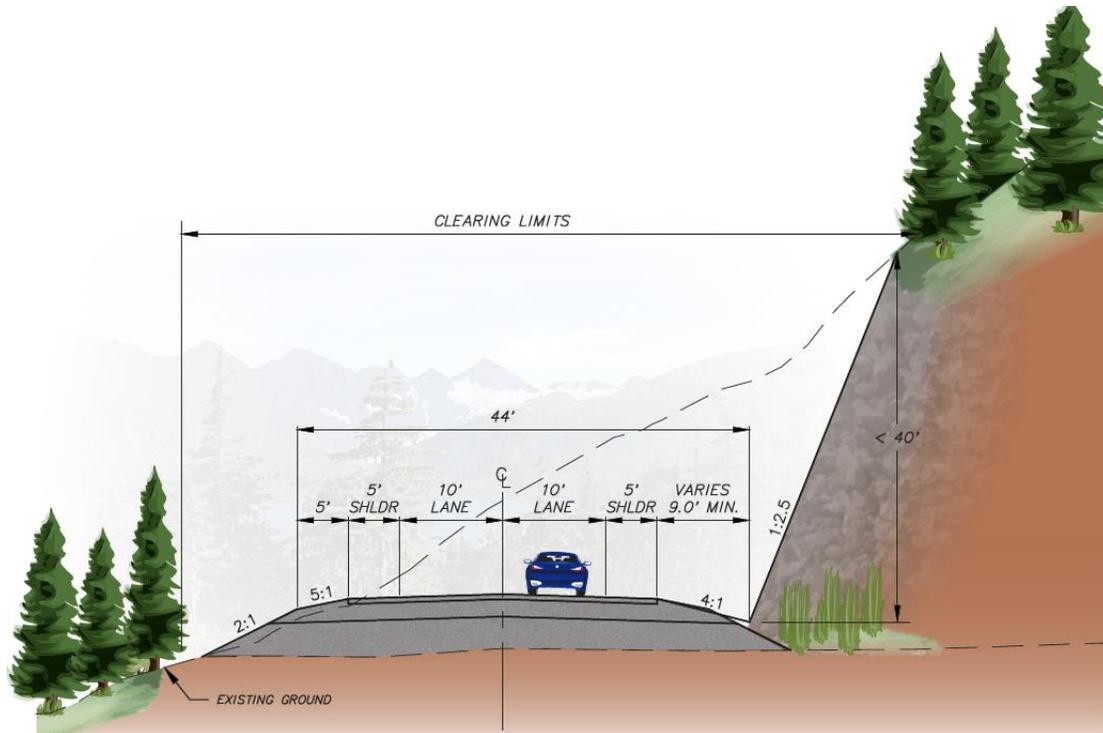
Typical Shotgun Cove Road Extension Project Mainline Road Cross Section
